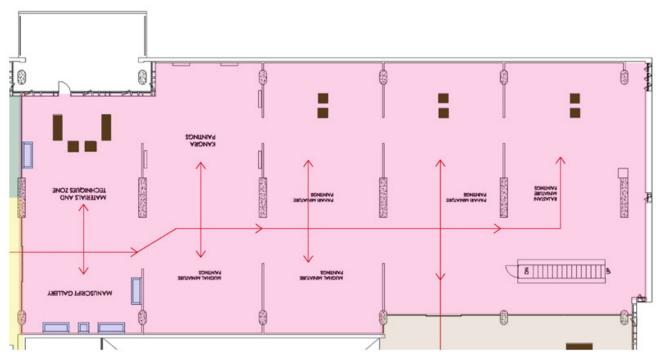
Proposed layout of Miniature Gallery on the First floor
